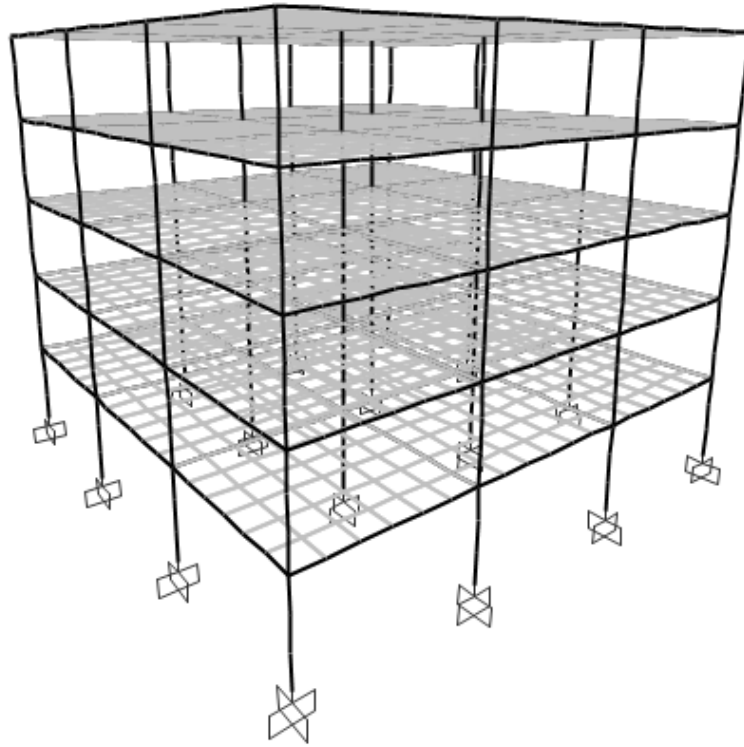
3D finite element model of 5-story, 3-bay frame
